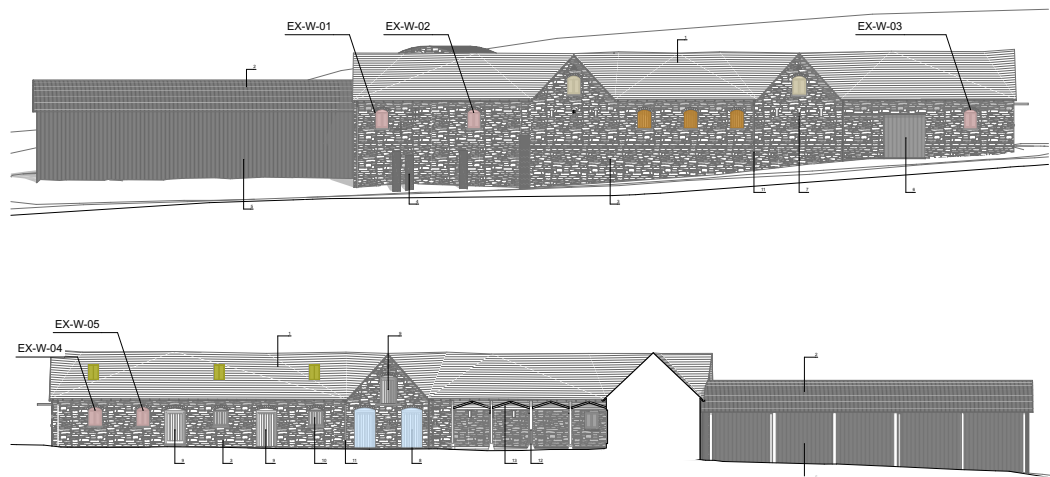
East (bottom) and West (top) elevations with unauthorised windows/doors highlighted
